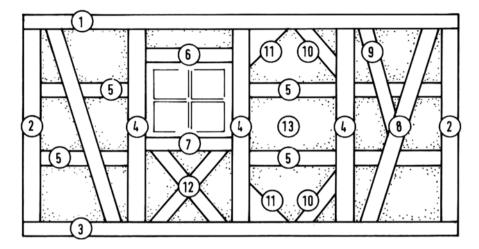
Half-timber construction, support elements and infill [77]. (1) Top plate. (2) Corner post. (3) Sill plate. (4) Post. (5) Noggin piece. (6) Lintel. (7) Sill. (8) Brace. (9) Counter brace. (10) Knee (tension) brace. (11) Corner block brace. (12) St. Andrew's cross. (13) Panel
